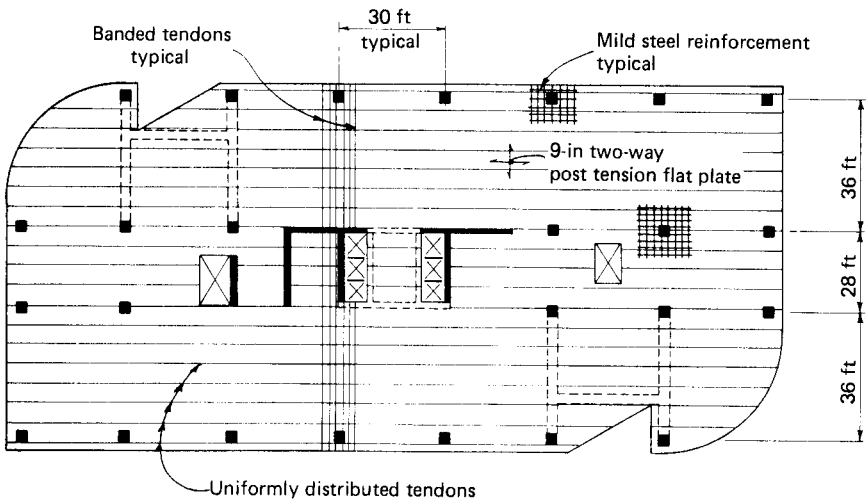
Typical floor plan of two-way posttensioned slab system.
